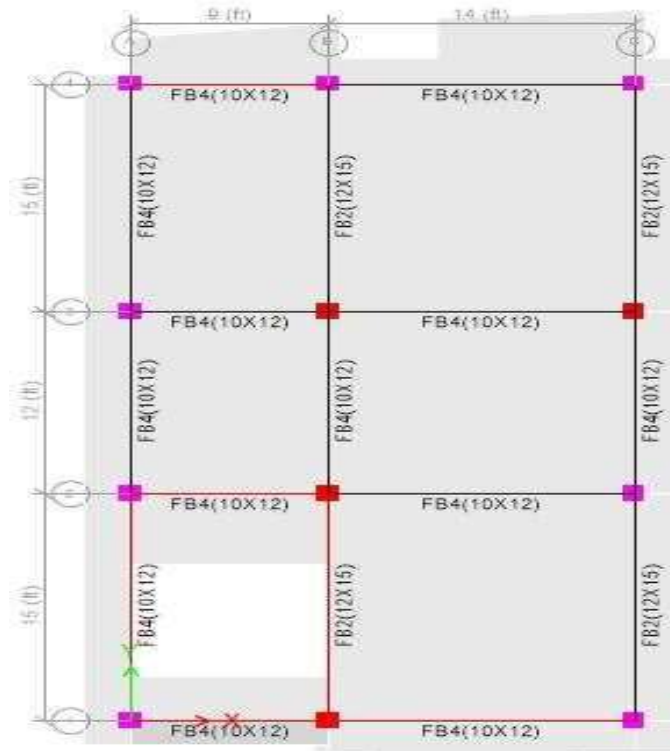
Plan View zone-4 ZONE-4 f'c =3000psi and Same frame section of zone-1 Some frames are failed Comparison For Concrete Strength, F'c (Elevation View, Zone-1)
